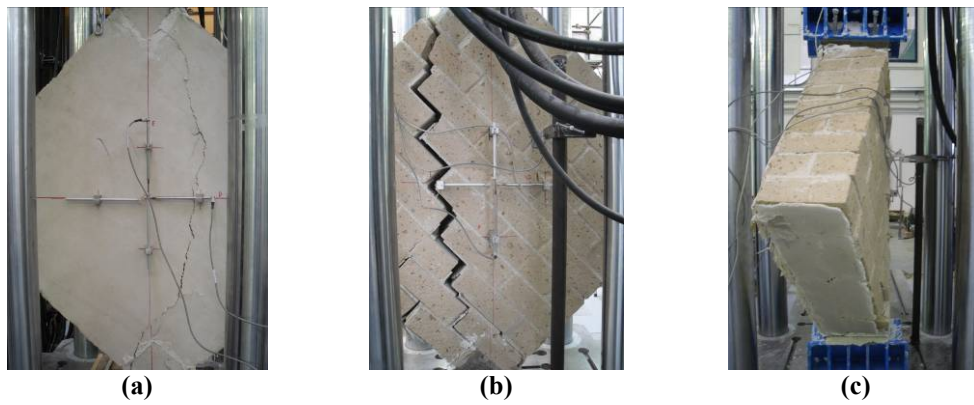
Crack patterns of PR1 specimen: (a) IMG system side; (b) Masonry side; (c) Lateral view.
